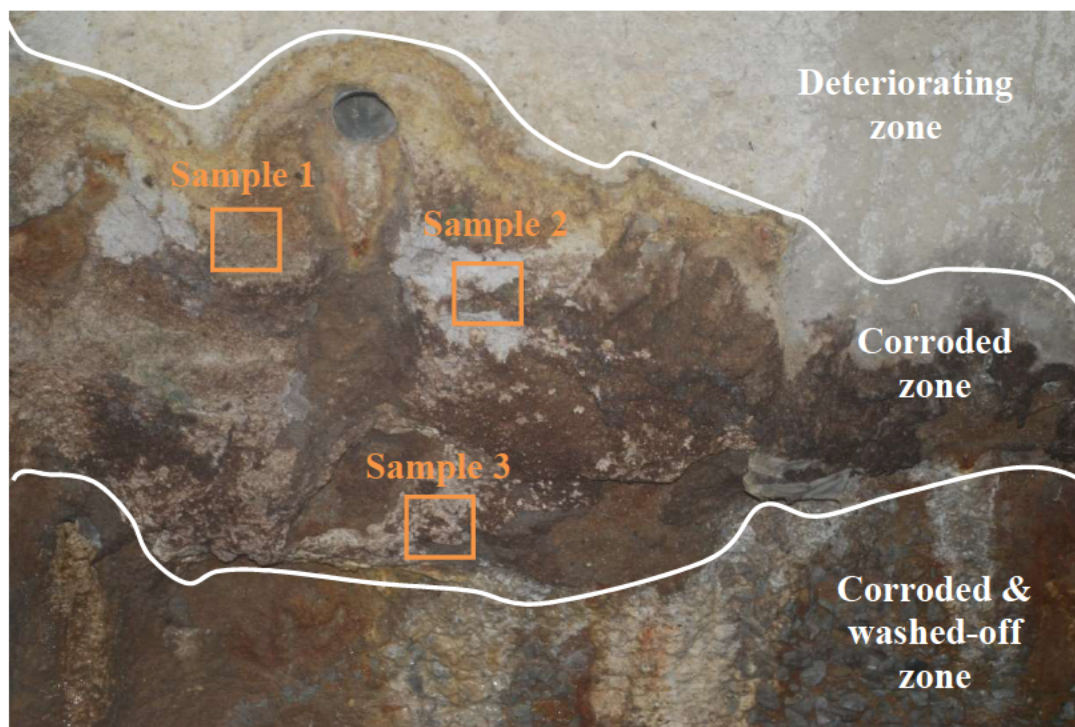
Sampling of corroded product on concrete wall
